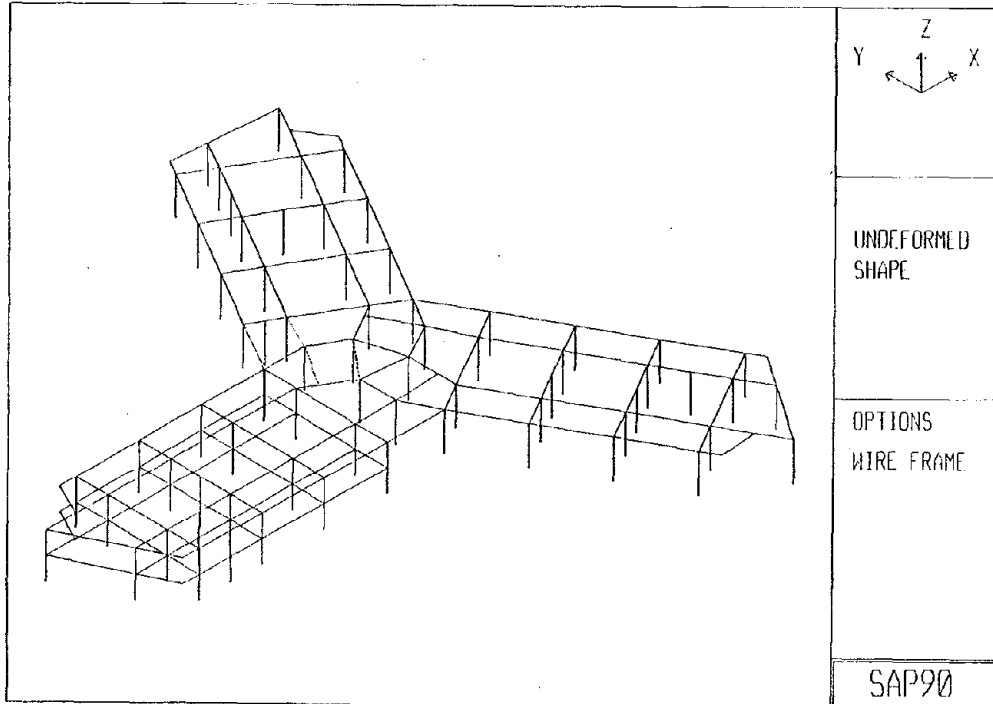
Isometric view of mezzanine and 2nd floor, SAP 90
